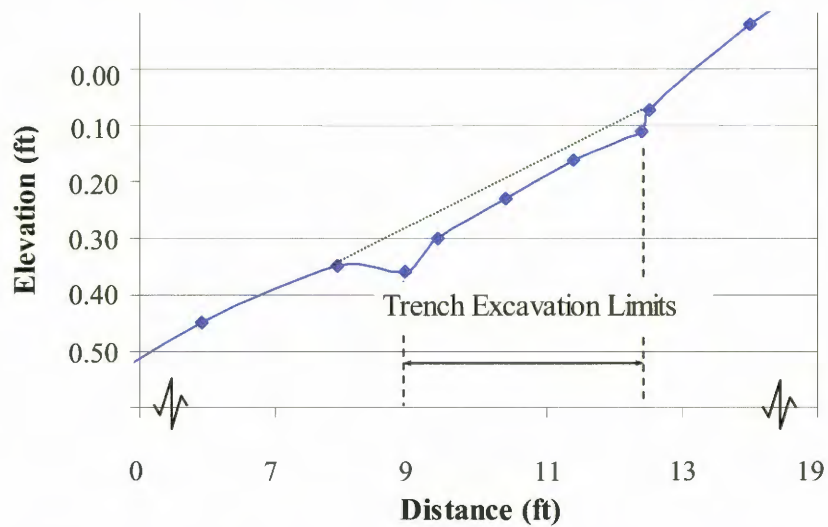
Settlement profile of poorly performing utility cut in concrete pavement.
